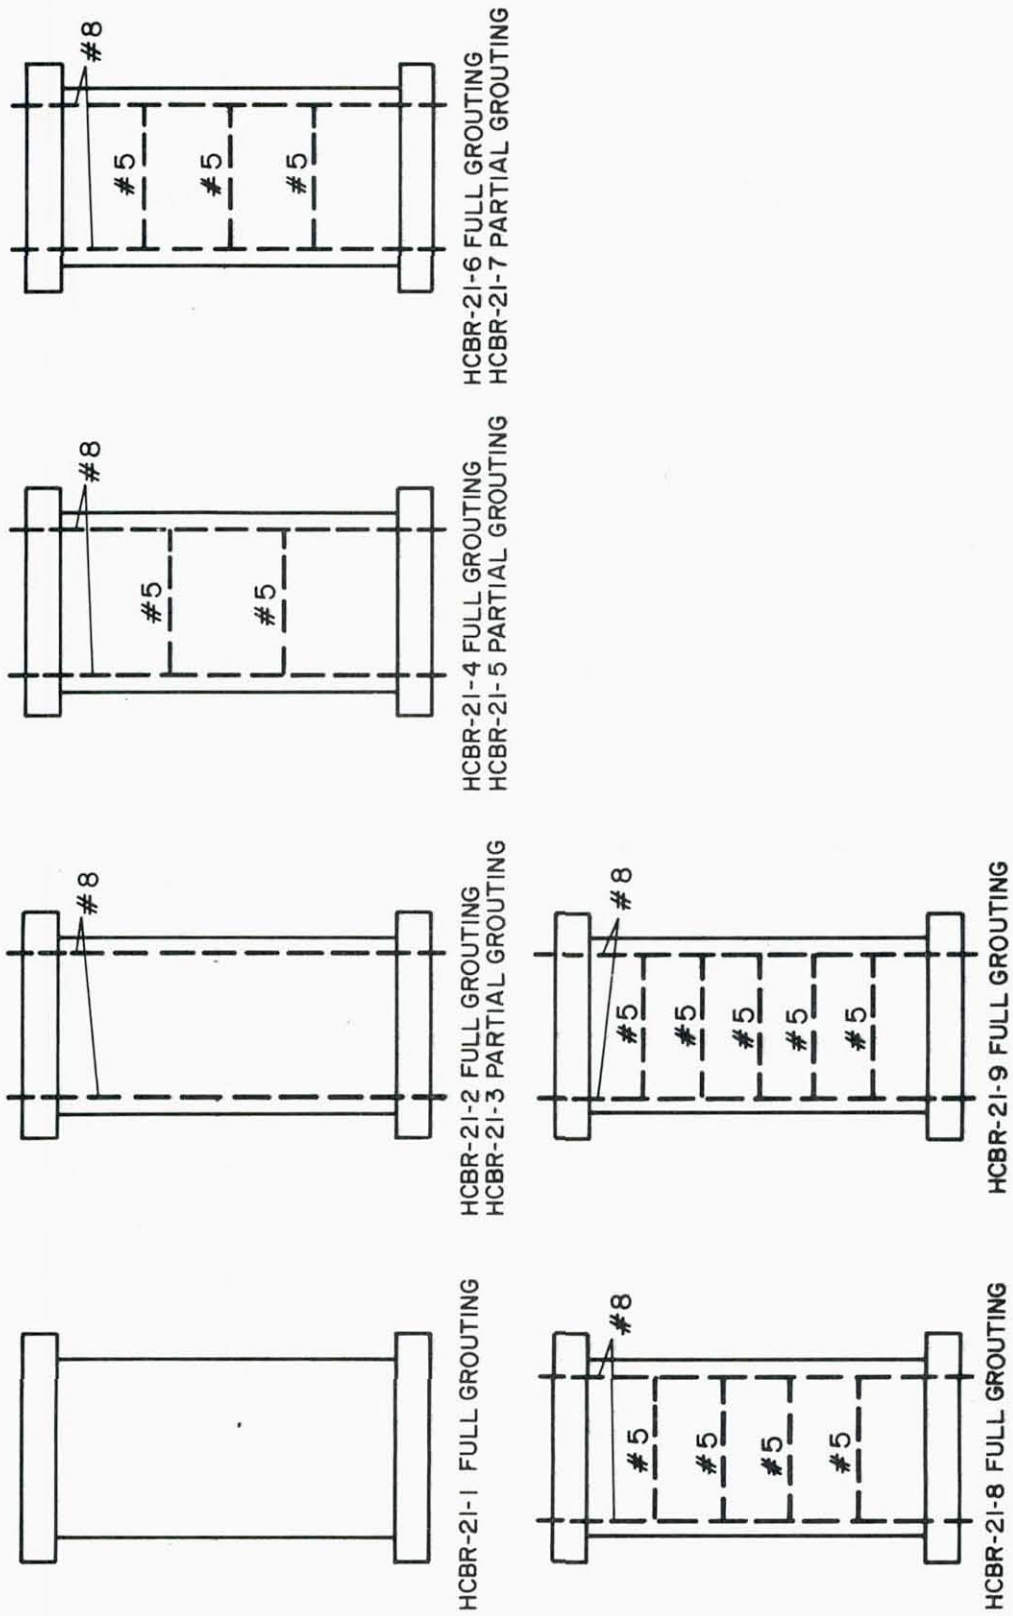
(a) REINFORCING STEEL ARRANGEMENTS FOR HOLLOW CLAY BRICK PIERS (HCBR)
